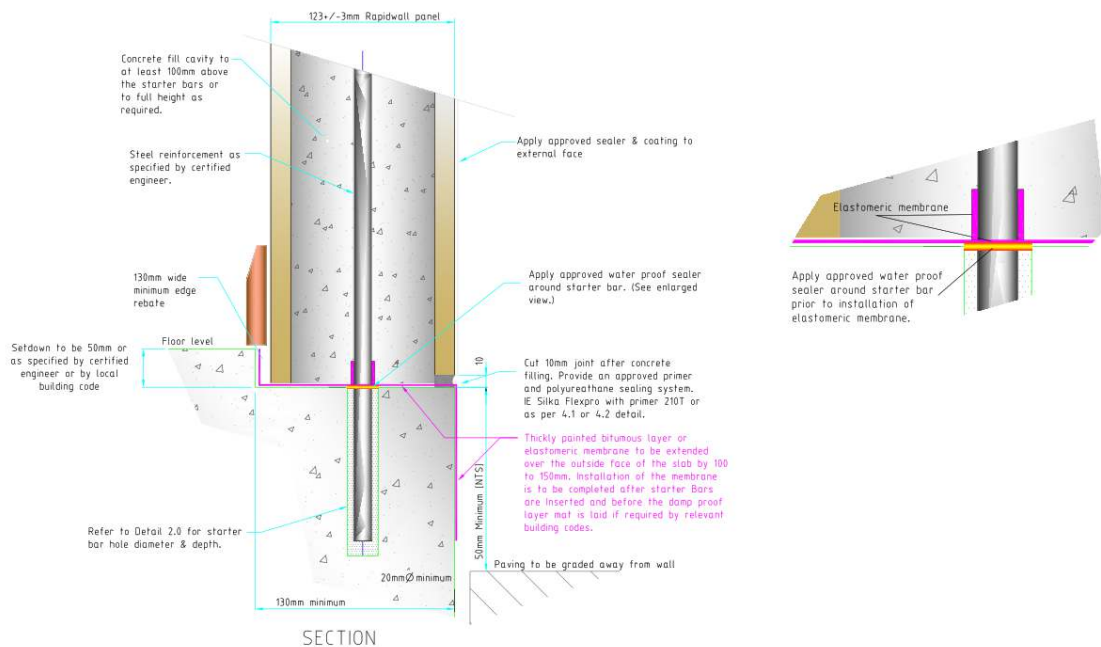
Concrete filled Rapidwall External wall to footing connection option 1 of 3
